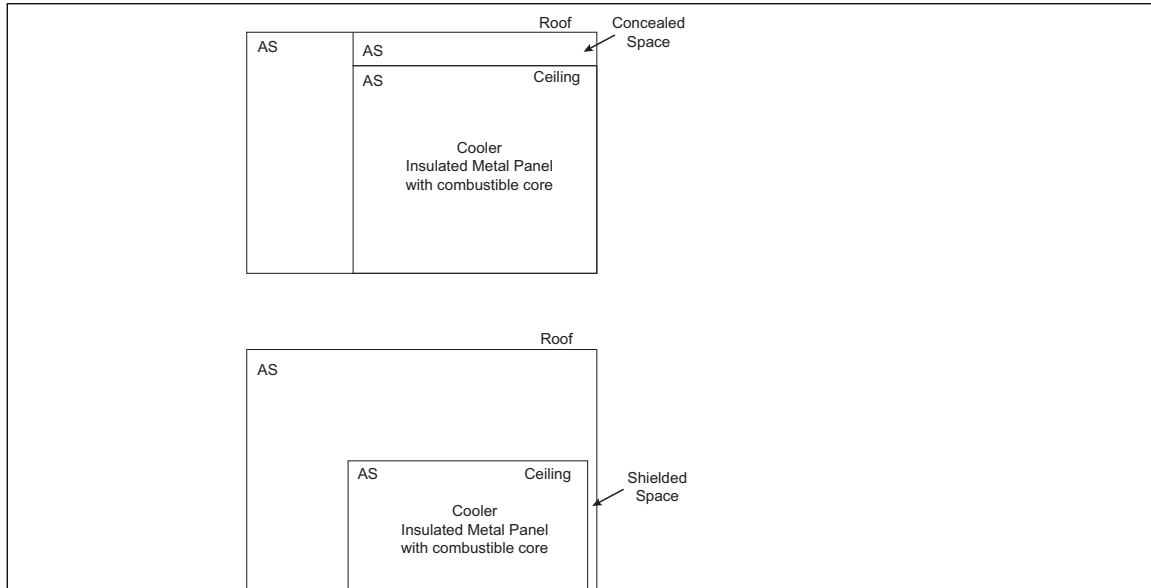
Section view of concealed or shielded spaces in a building
